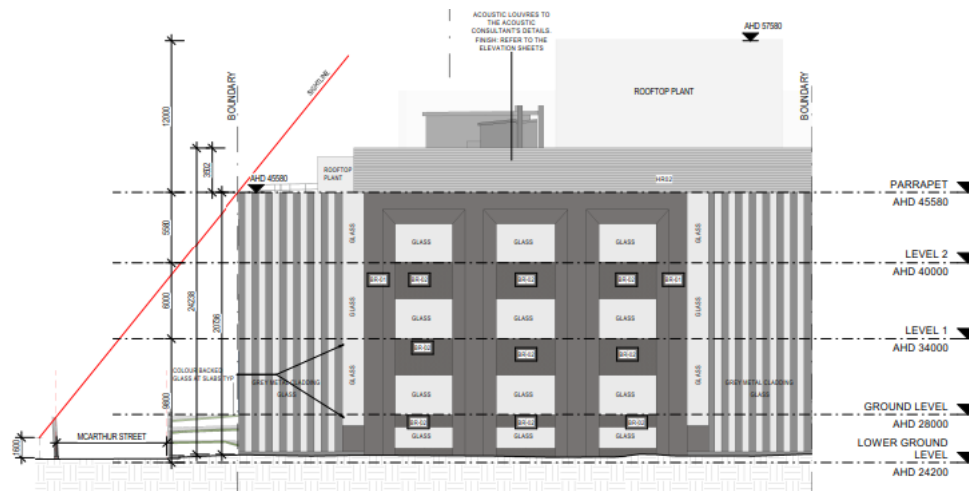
Detail of south elevation (Indwe Street) of proposed data centre
